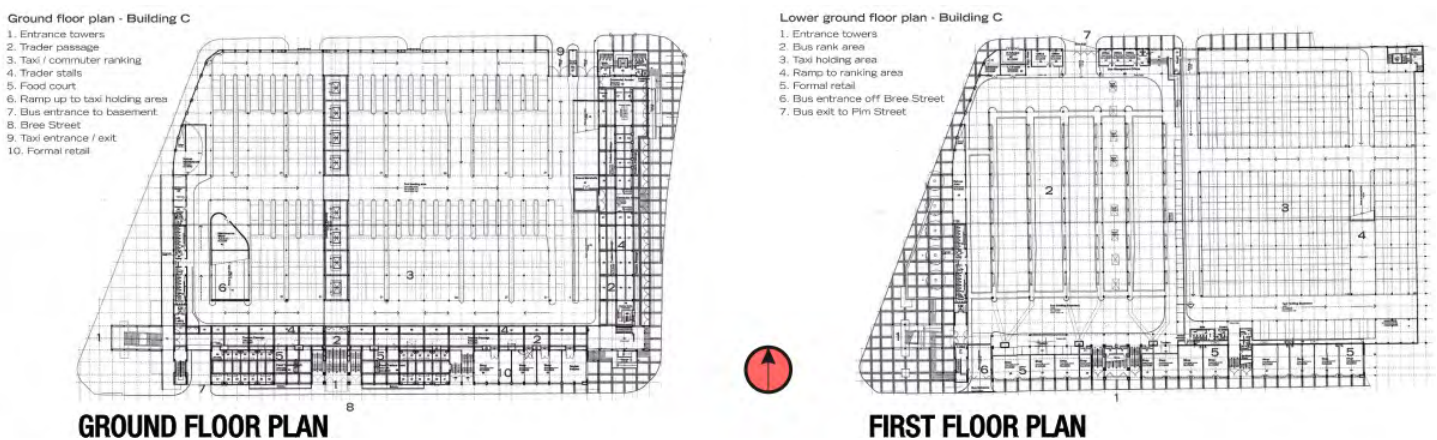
Floor plans of Metro Mall (Deckler 2006: 61)
